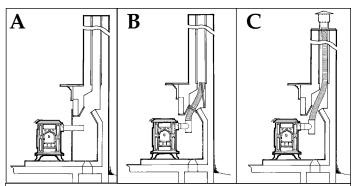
Illustration A above depicts the worst possible fireplace installation - leading to creosote and backpuffing. B is a halfway point - a flexible pipe runs just up to the point where the chimney's tile liner starts. C is the best fireplace installation - one full liner from top to bottom. These liners come in kits complete with cap, top plate, tee and flexible stainless steel liner.
